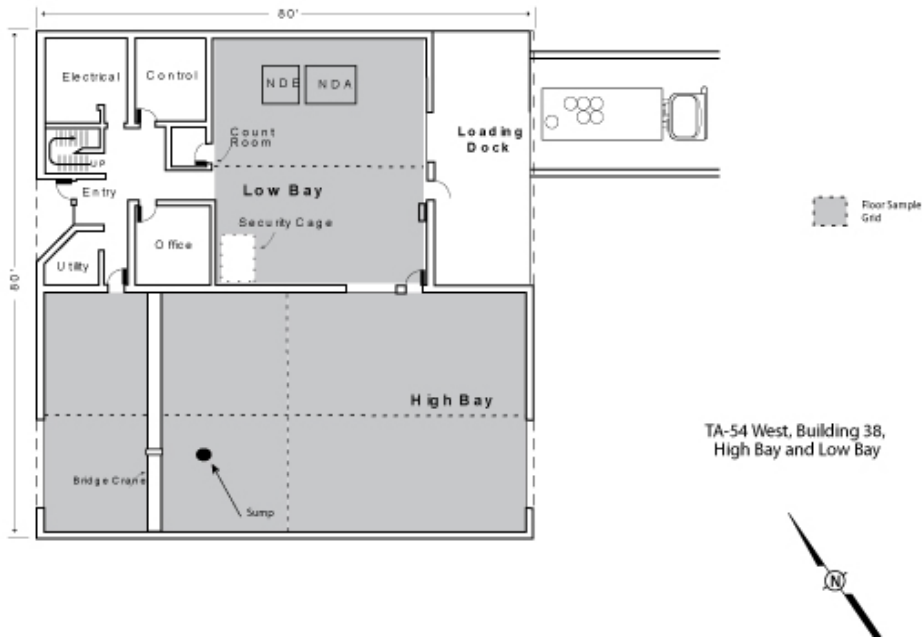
Technical Area 54, Building 38 (High, Low Bay, and Loading Dock Sampling Locations)
